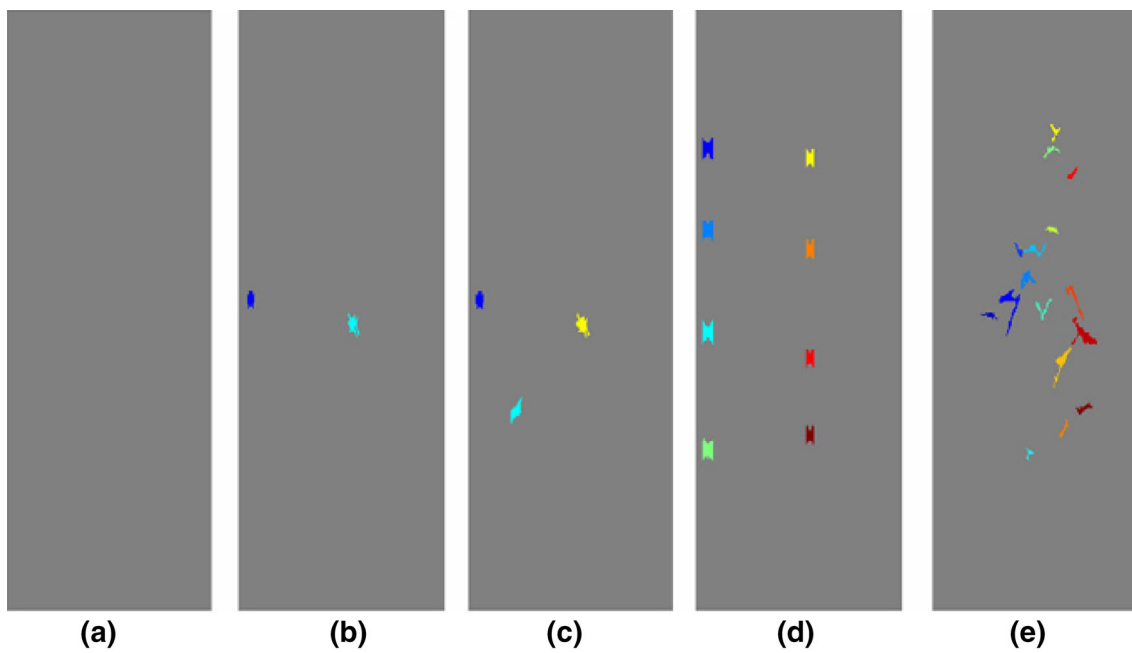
Binarization of 3DRT and pattern extraction: a without cracking, b horizontal and vertical cracking, c horizontal, vertical and diagonal cracking, d block cracking, and e alligator cracking [159, 167, 168]
